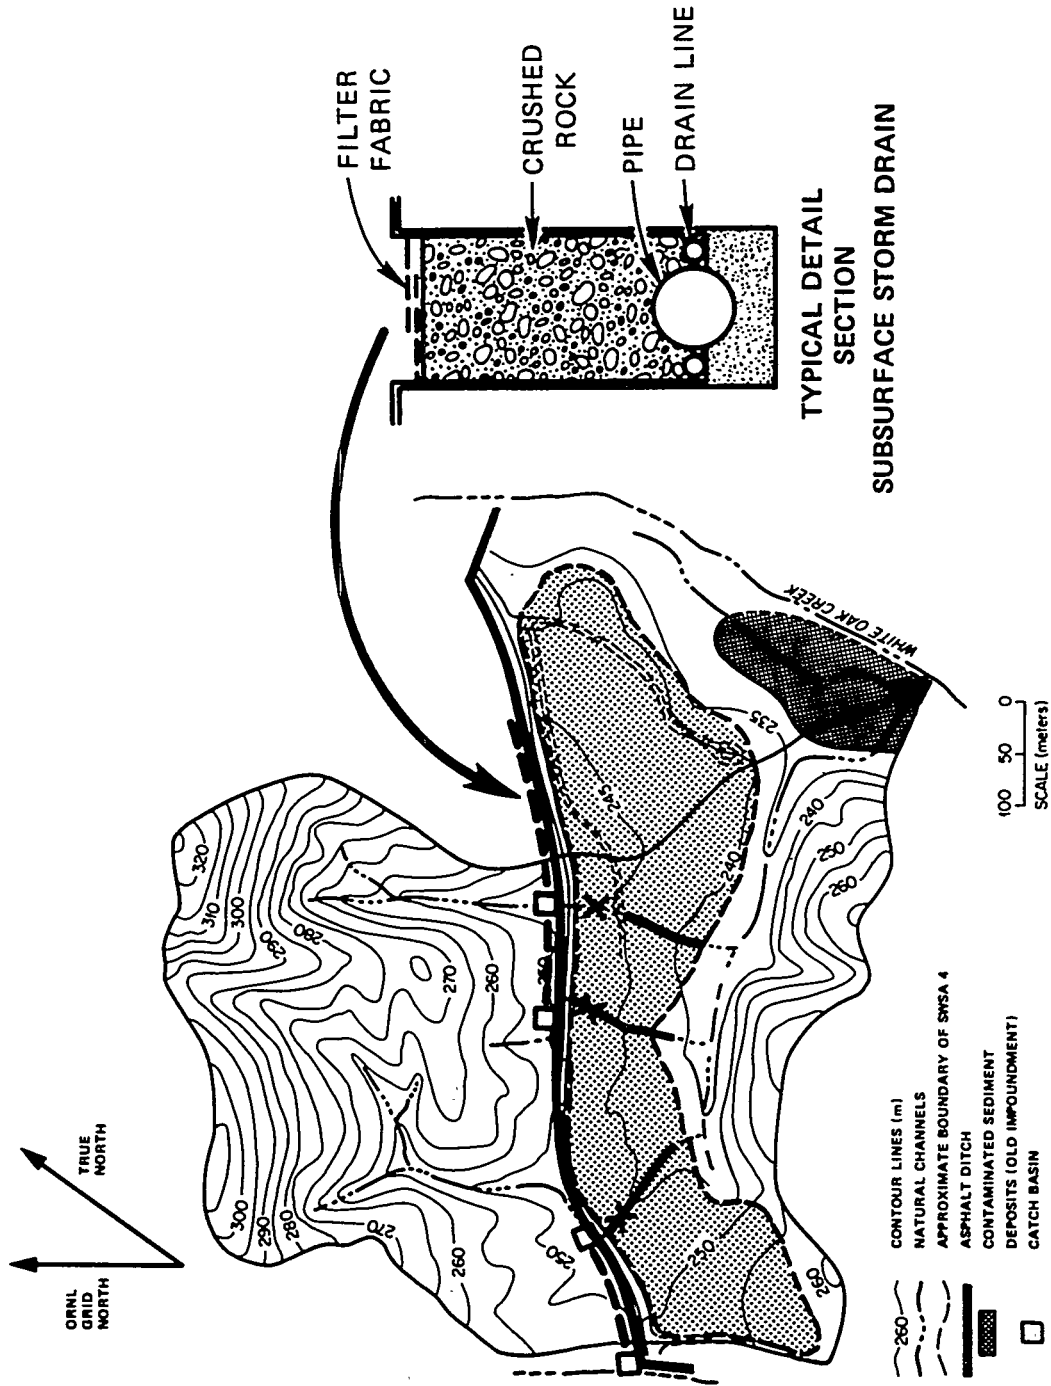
Plan view of the 1983 SWSA-4 surface water diversion project.
